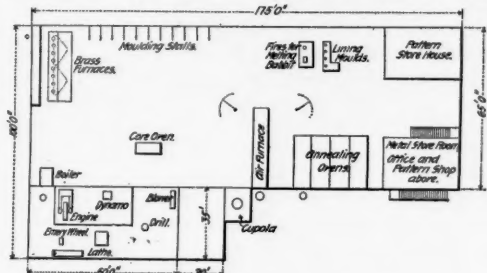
Floor Plan of Atlantic Brass Co.'s Works.
